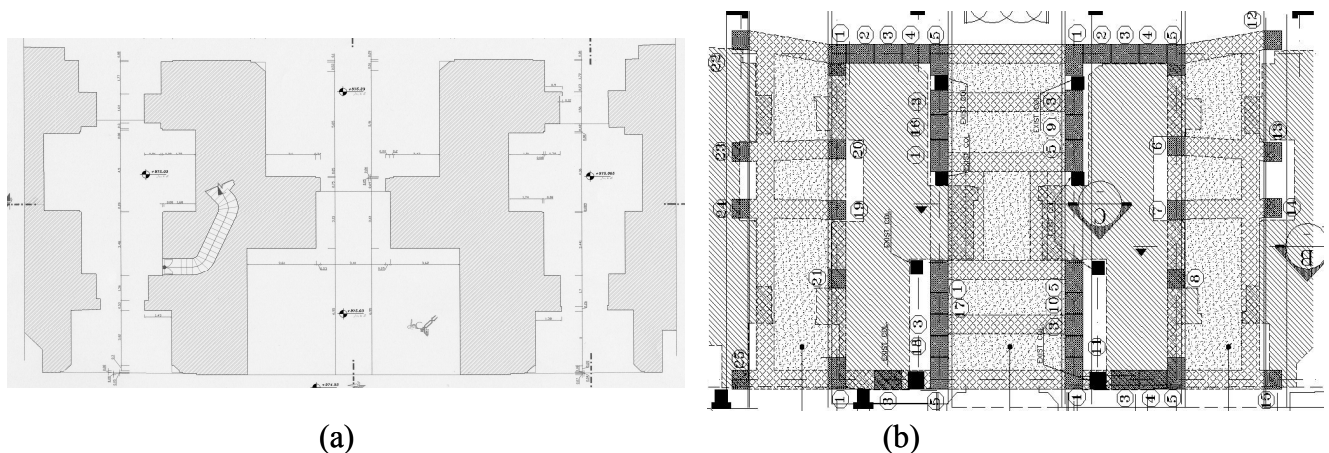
(a) ground floor plan of the edifices, pillars are hatched, (b) Piles layout around the pillars
